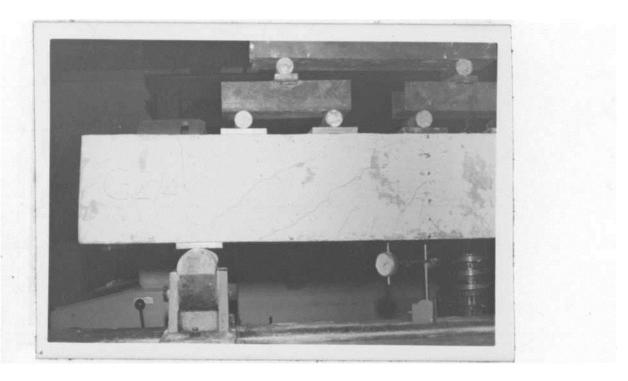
Close-up of diagonal cracks of beam G2/L during loading.
